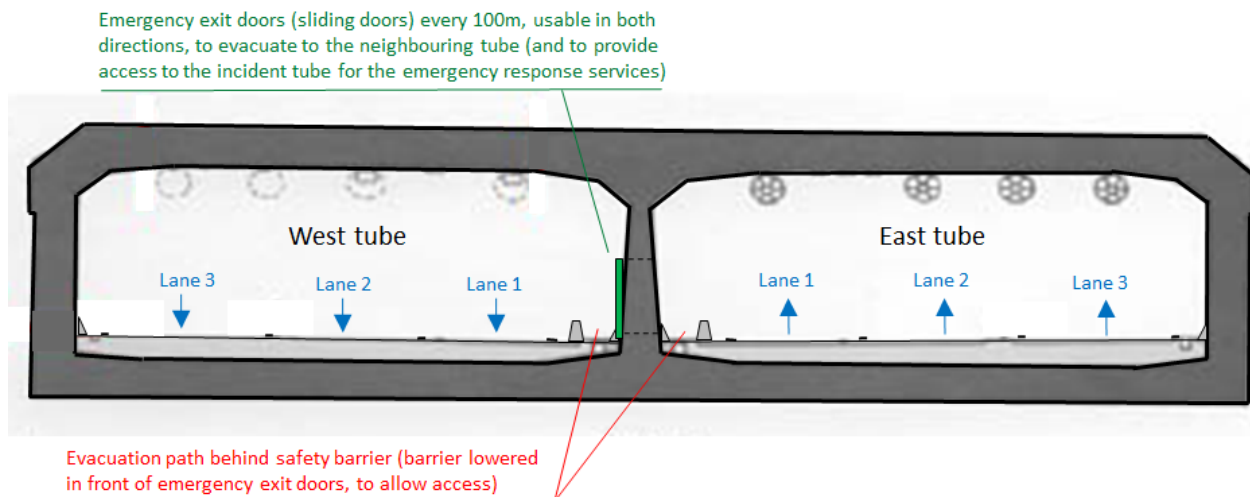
Cross-section of the Heinenoord Tunnel in the current situation.
